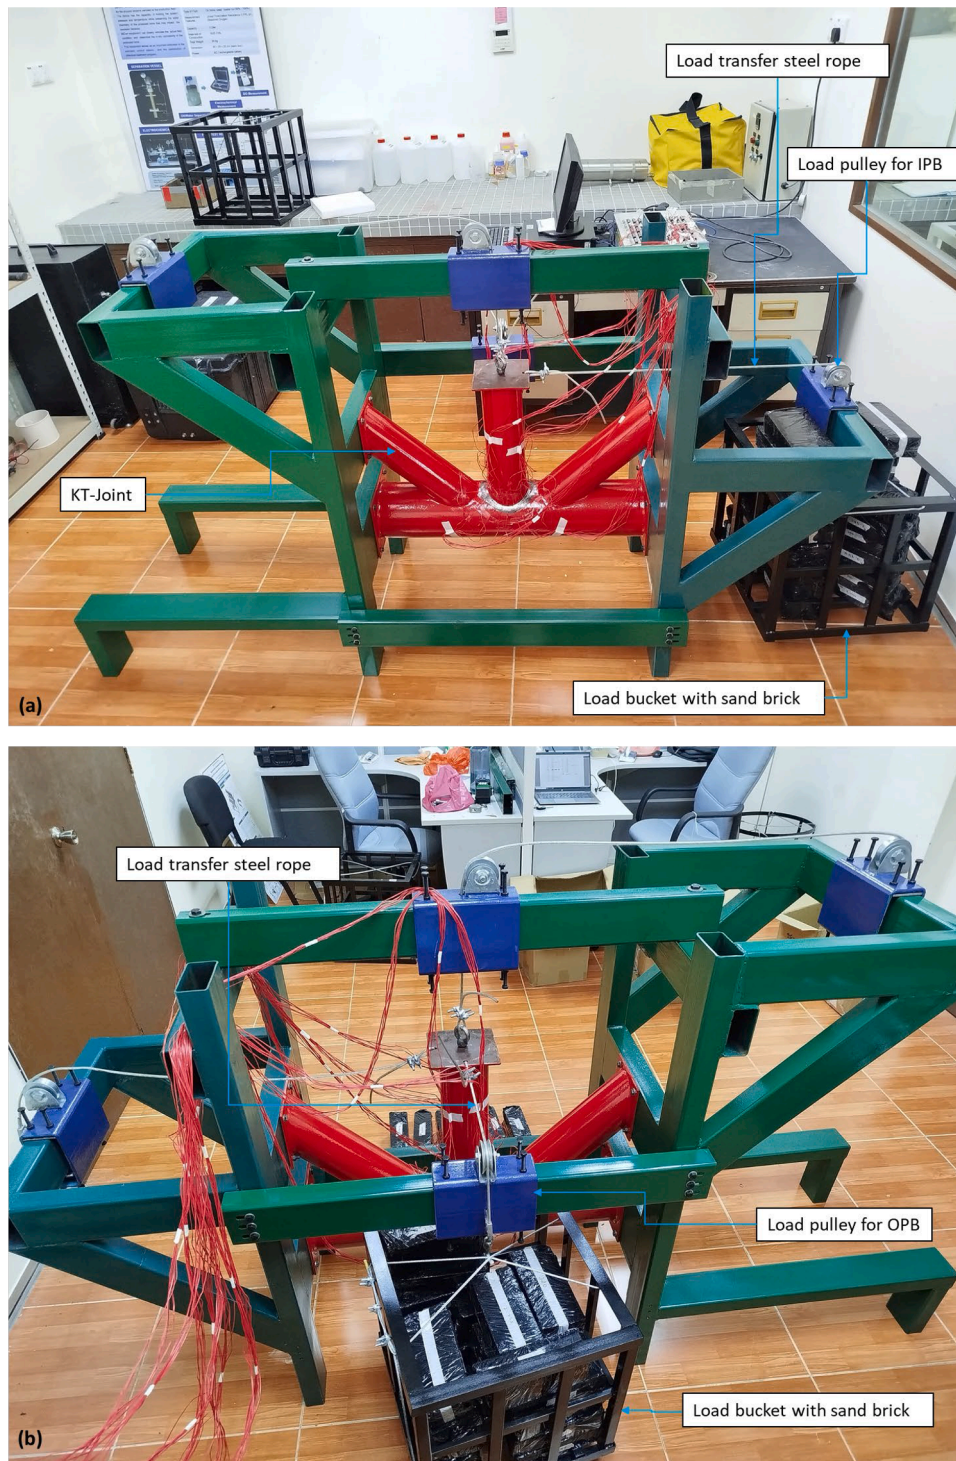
Setup for testing KT-joint: (a) IPB (b) OPB.
